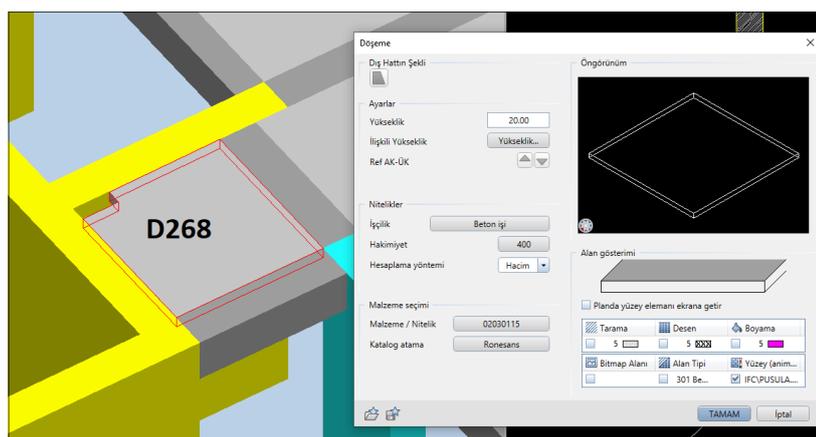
Incorrect Floor Thickness in D268 Floor in Allplan Model
